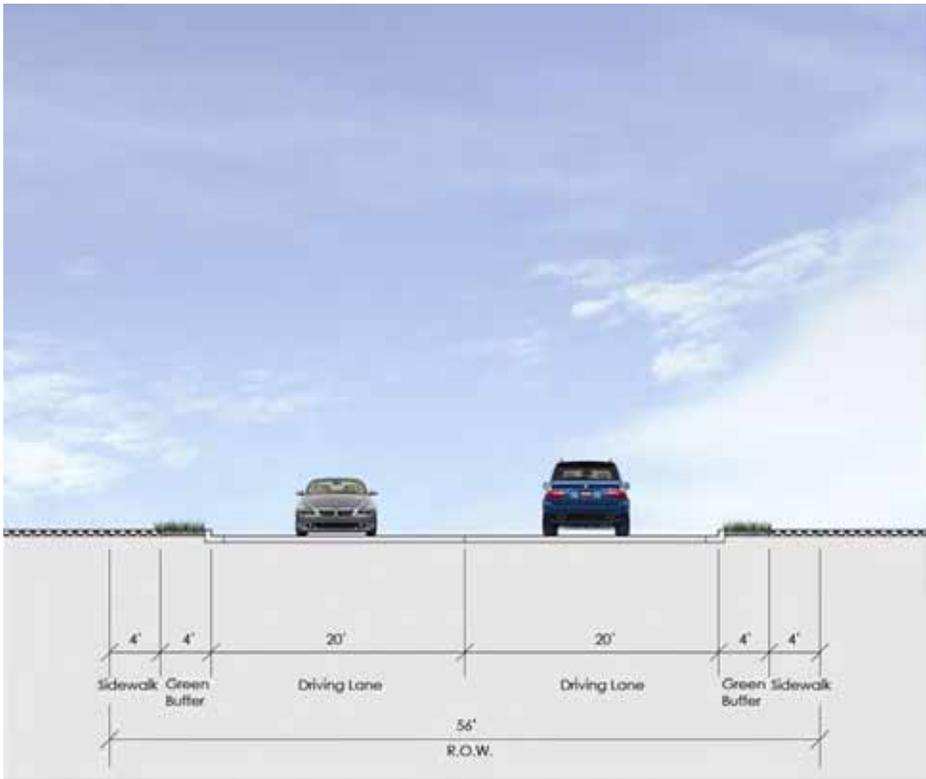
Existing Street Section - Berry Street - Fort Worth
